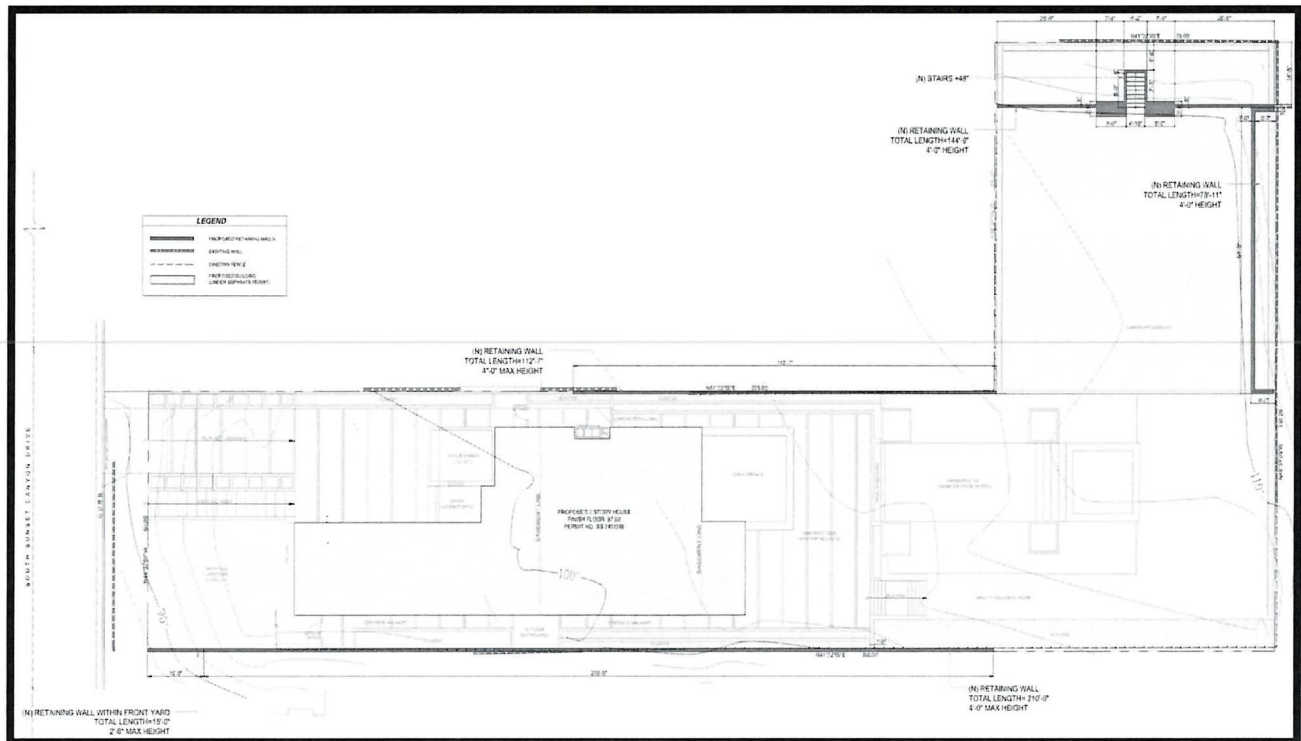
Site plan of the proposed Project, which includes the new retaining walls ranging in height of 2'-6" to 4'-0".
